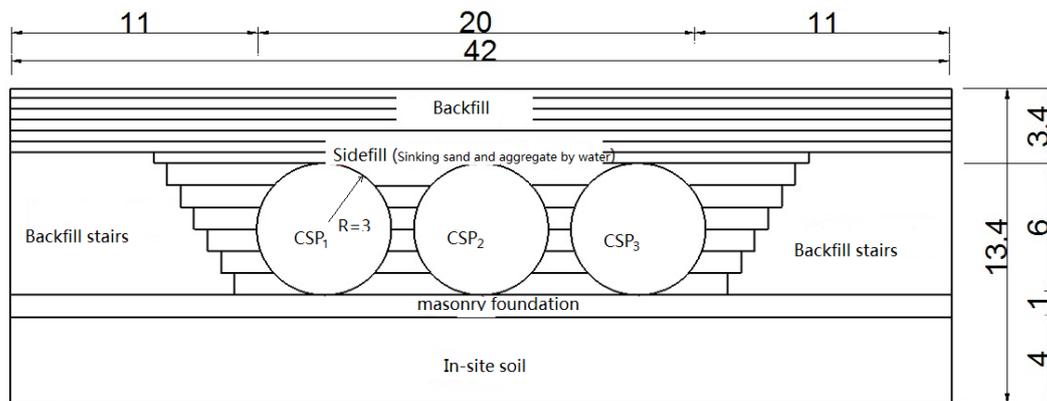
Plan and schematic finite element model of on-site CSPs in embankment (m)
